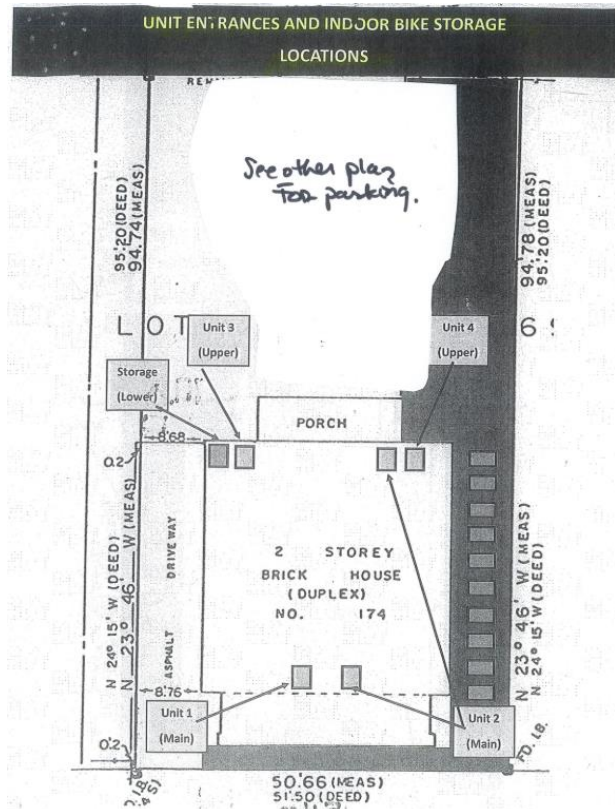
Proposed unit entrances and indoor bike storage locations.
